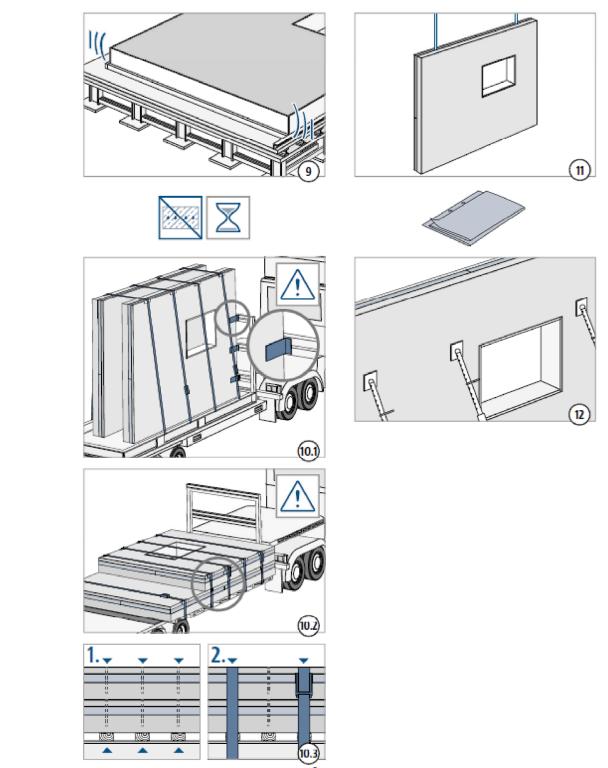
Installation instruction - Schöck Isolink® for sandwich wall - page 2
